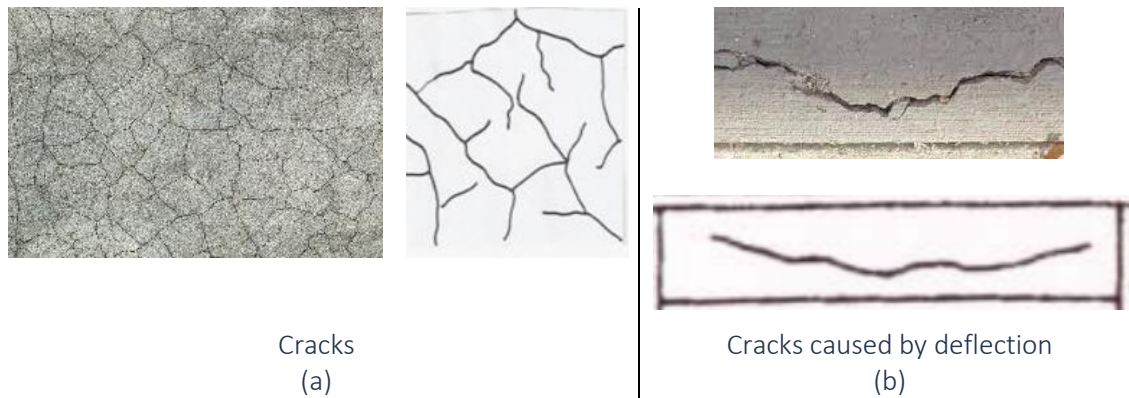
Type of cracks. A) normal cracks. B) cracks due to deflections.
